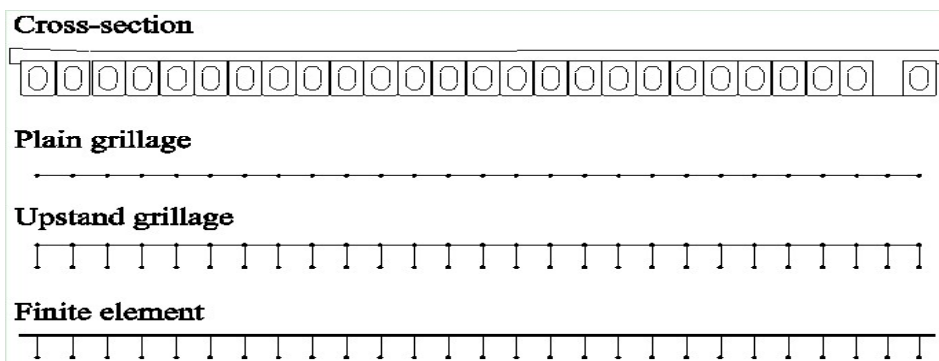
Cross section of the bridge deck and equivalent plane grillage, upstand grillage and finite element models.
